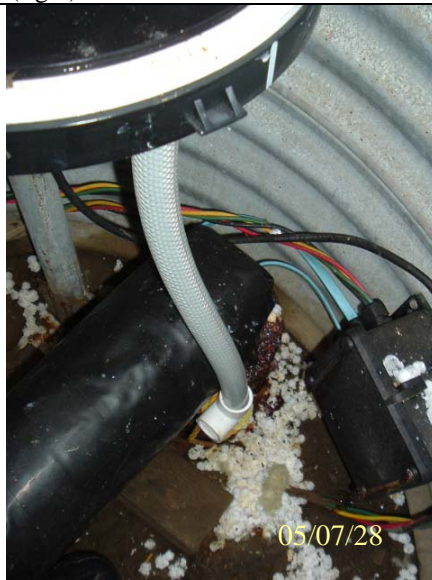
3100 Wellhead and pellet chlorinator. Note pellets in bottom of pit.
